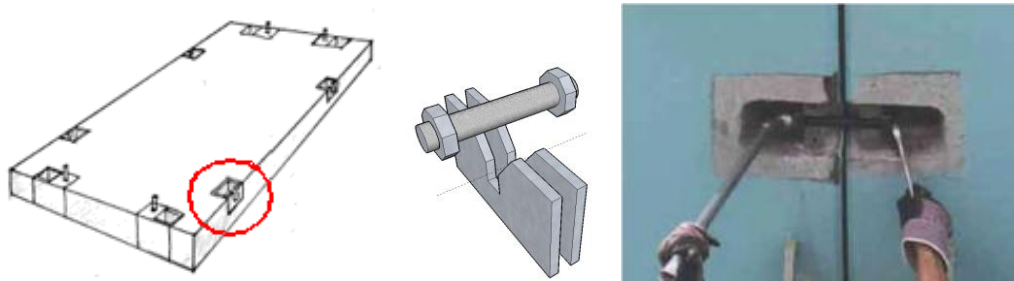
Floor-to-floor connection for concrete elements, Consolis (2007).
